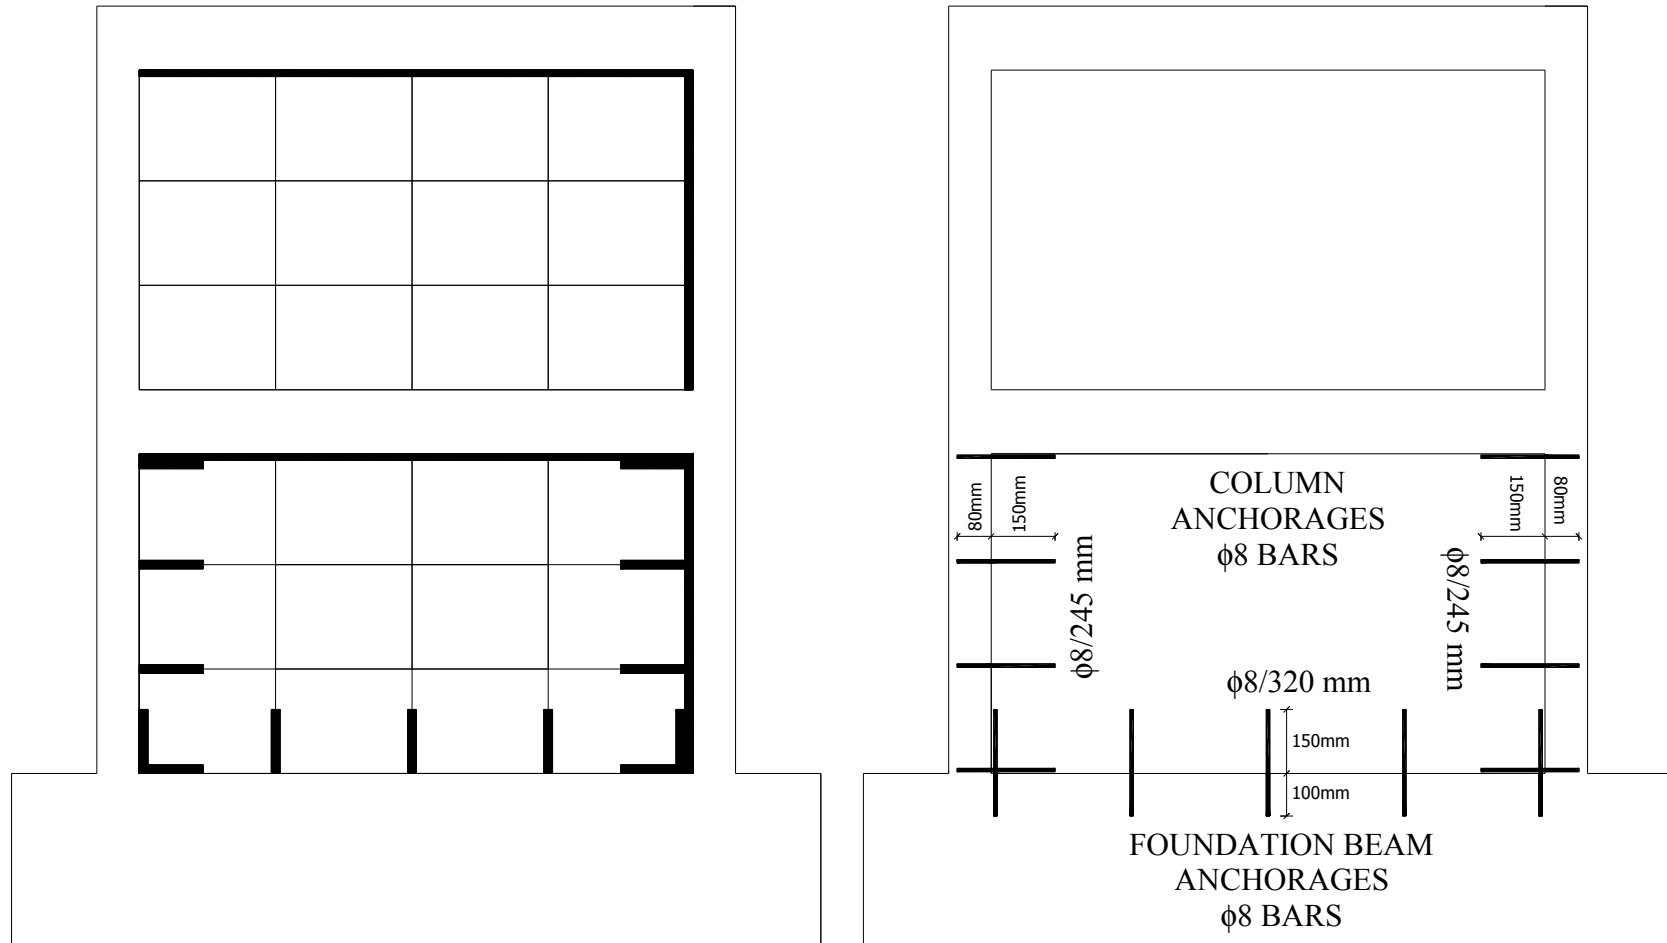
Panel arrangement and configuration of the dowels for Specimen CIC3
